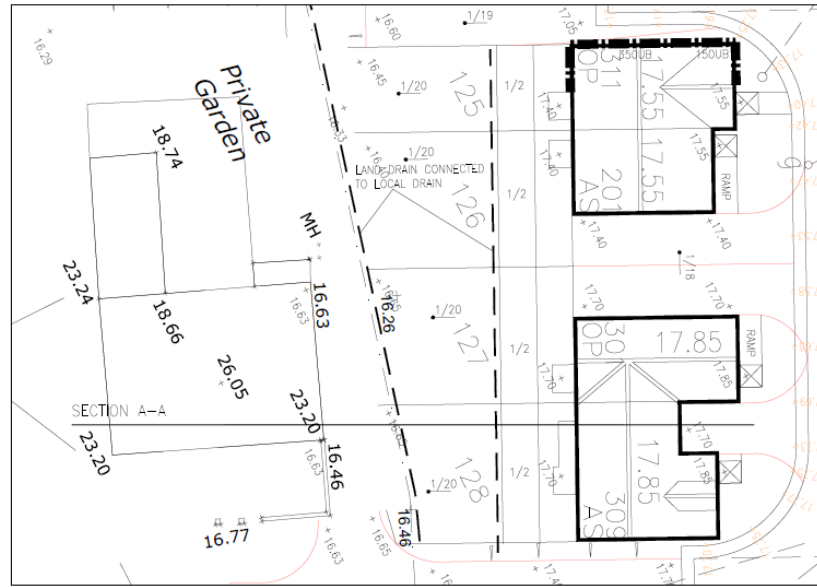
Proposed section of plot 128 with 1 Northcliffe House
